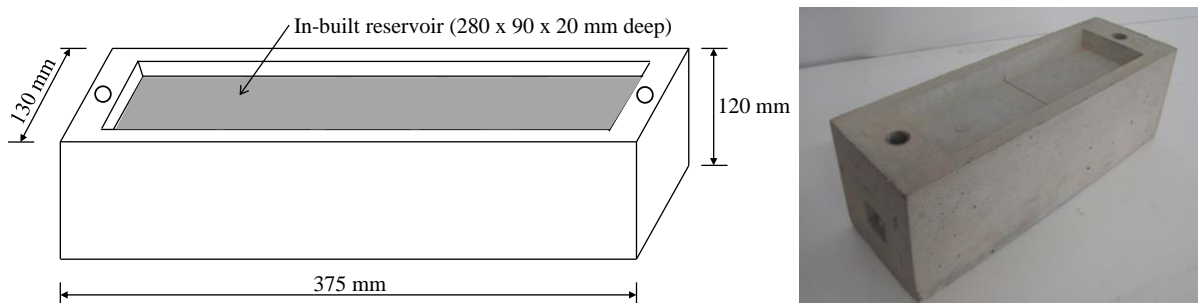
Sketch and photograph of a typical 120 x 130 x 375 mm beam specimen
